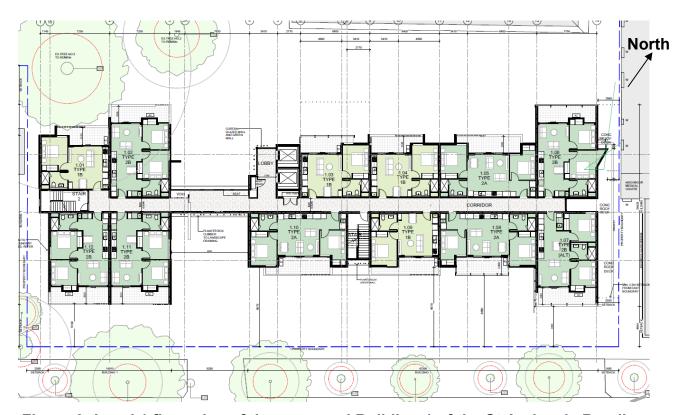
Level 1 floor plan of the proposed Building 1 of the St Andrew's Bendigo Housing Development.
